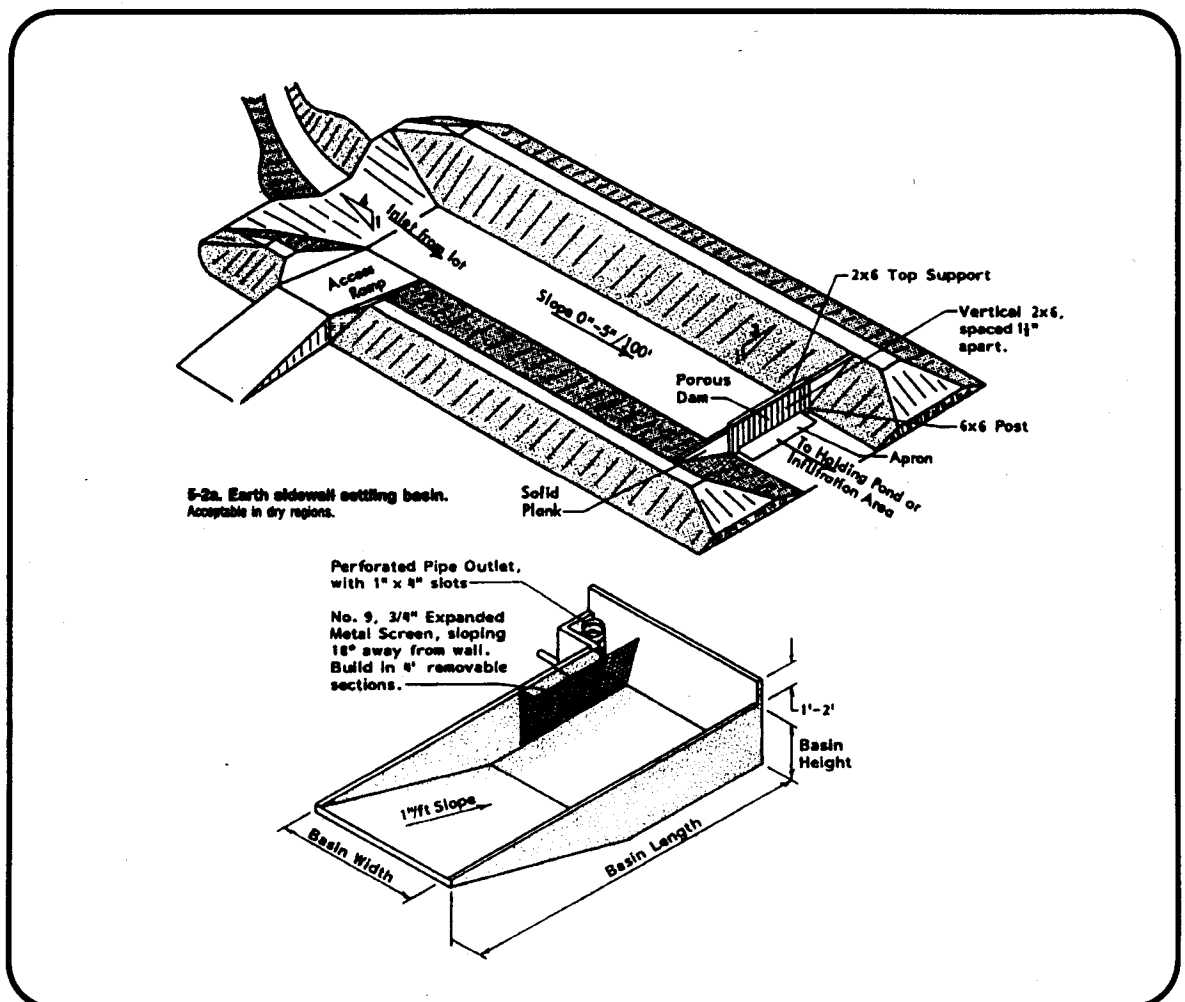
Settling basins.Source: *Livestock Waste Facilities Handbook, Midwest Plan Service, 1985.
